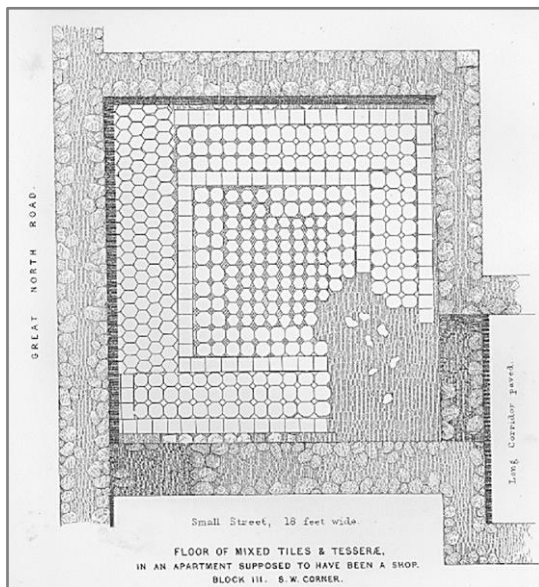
Plan of the floor of mixed tiles and tesserae in block III (After Joyce, 1866 Plate XXIV)
